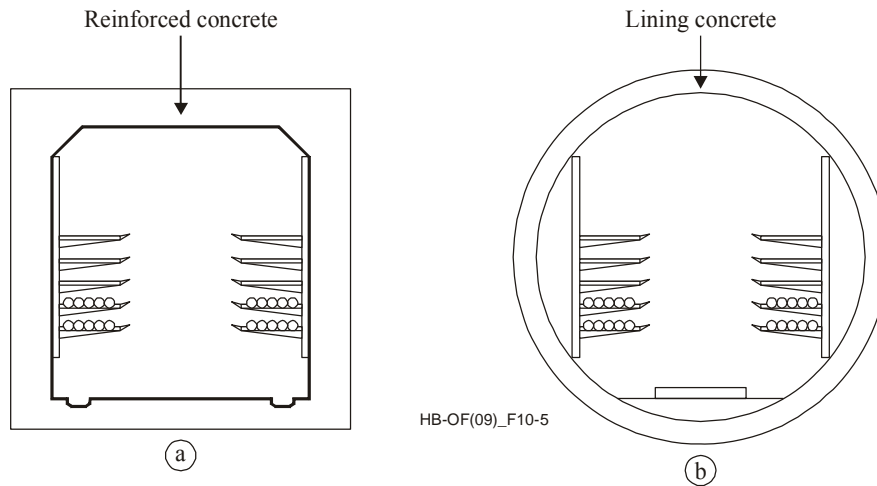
Typical types of cable tunnel: rectangular or box type and circular type
